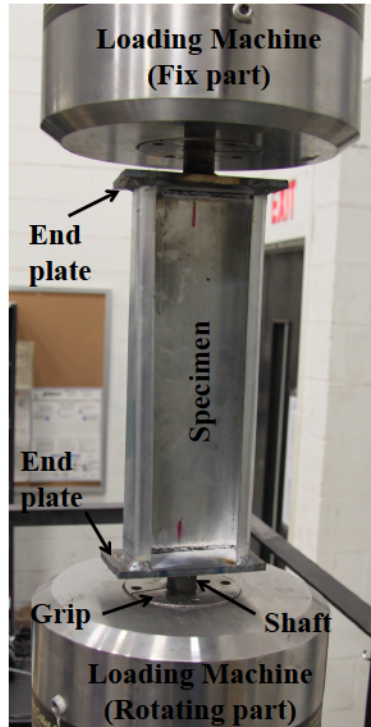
Torsion testing of cold-formed steel lipped channel: untwisted specimen in rig
